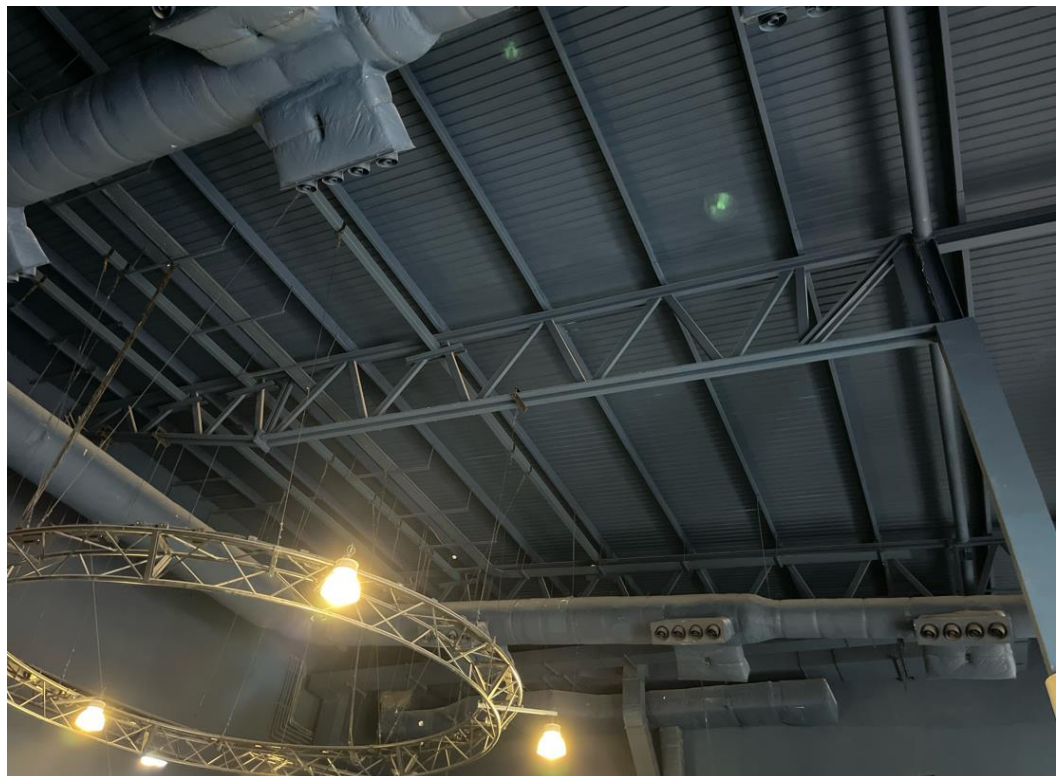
Exposed steel truss supporting roof of entertainment building.
